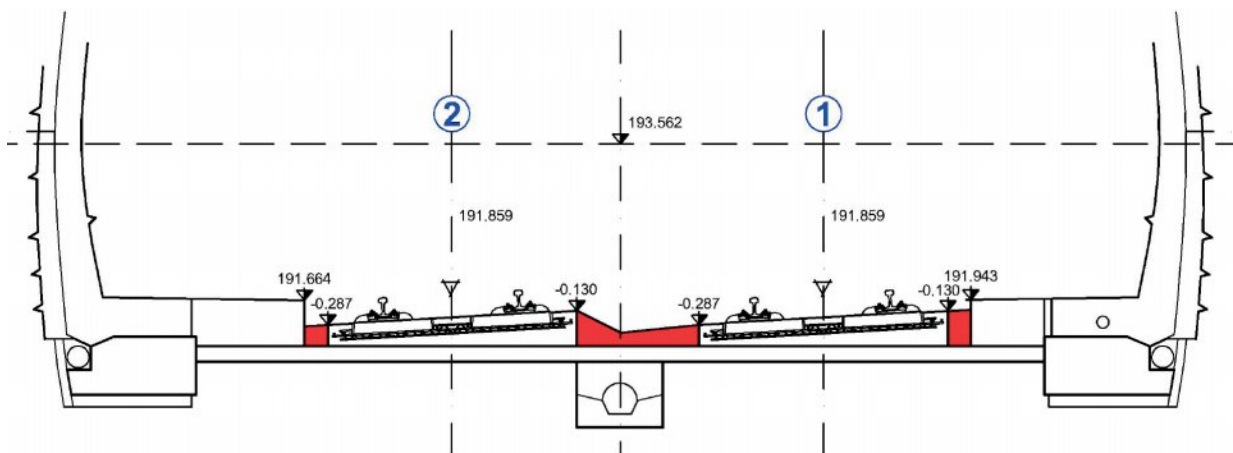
The structural design of the slab track in the tunnel (concrete filling - marked in red)
